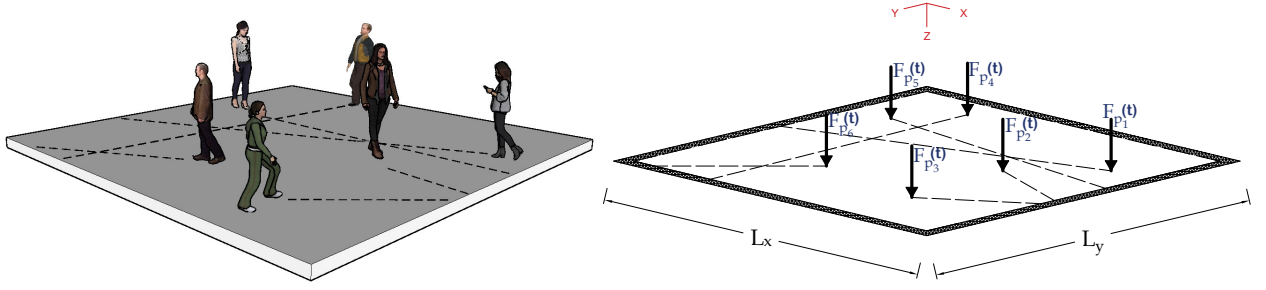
Modeling multi-pedestrian walking load on a rectangular floor
